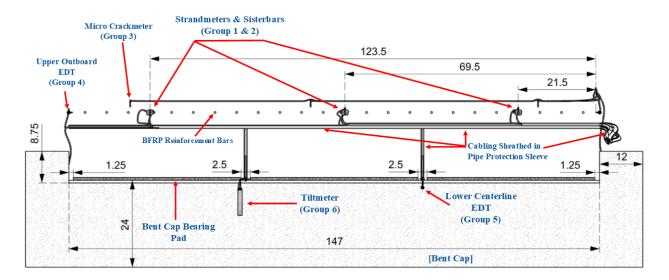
, Drawing, Bent Cap End View (Slabs, Beams, and Parapets not Shown)
